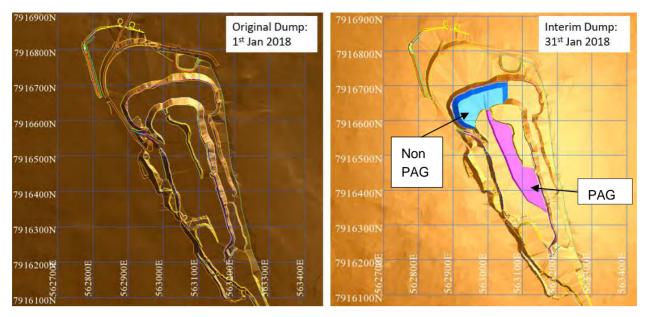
Waste Rock Plan (January 2018) - Plan View
